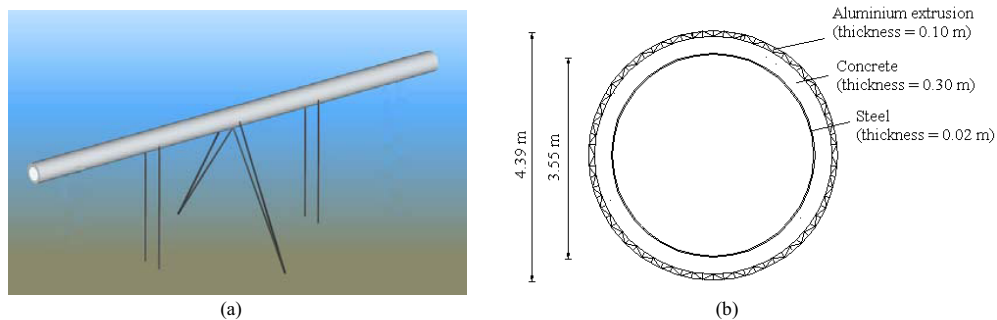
(a) Schematic diagram of submerged floating tunnel prototype at Qiandao Lake; (b) Cross-section of tube segment
